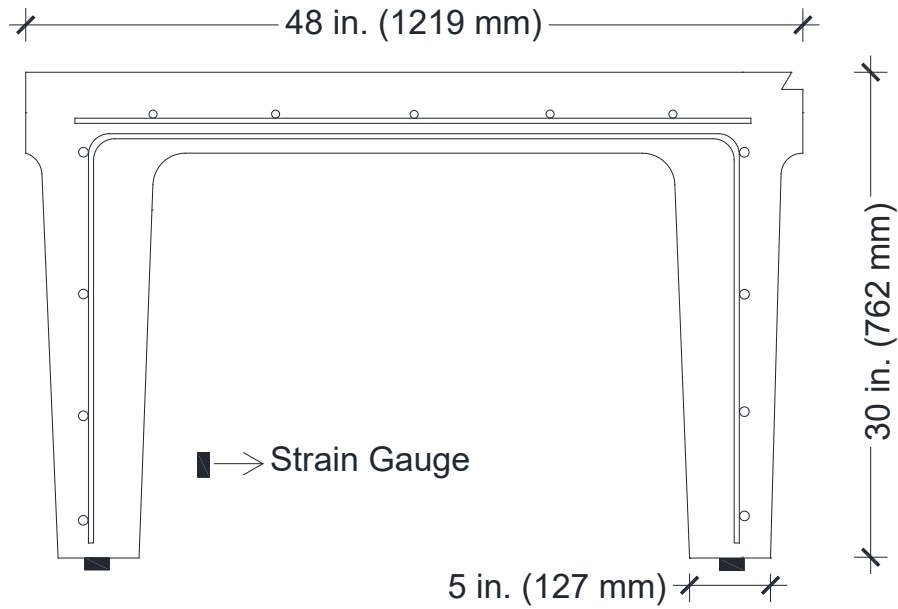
Girder Strain Gauge Instrumentation Plan for Flexural Response of 30-in. (762-mm) Deep Double-Tee Girder Bridge – Section View
